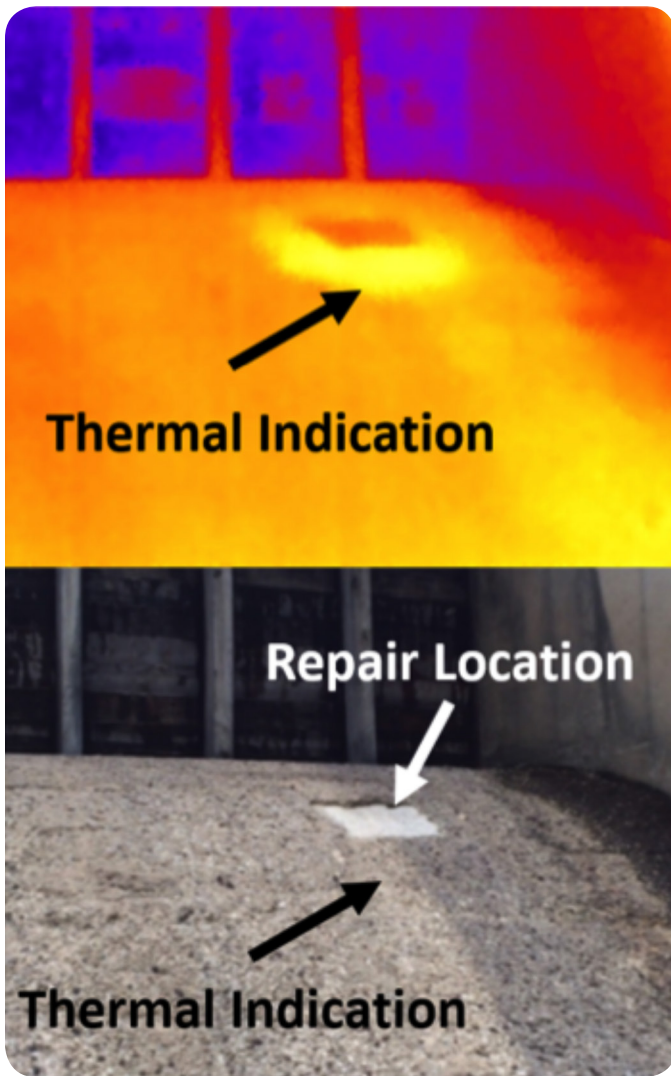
Indication of Potential Damage in a Concrete Structure
